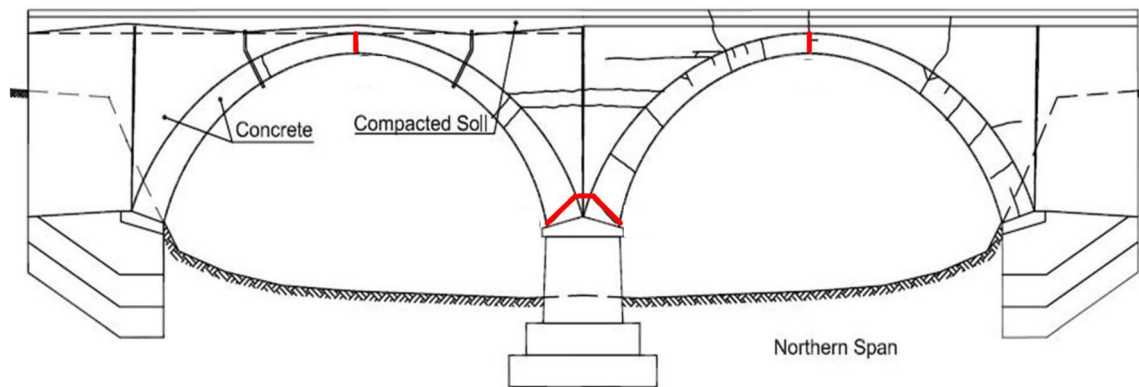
Crack pattern at final stage of static loading (field test). Cracks represented by red existed before the test (initial cracks)
